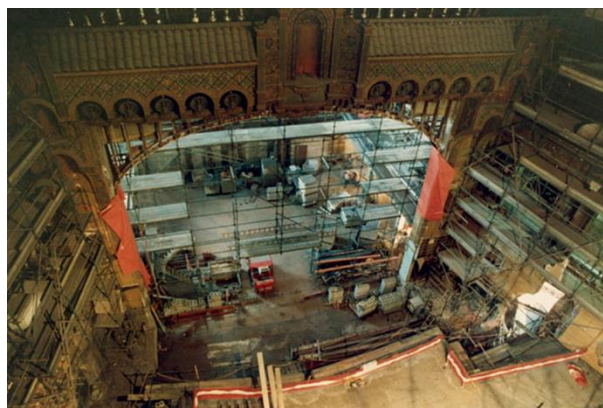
Elevated view of Manning Building demolition during restoration of theatre.
